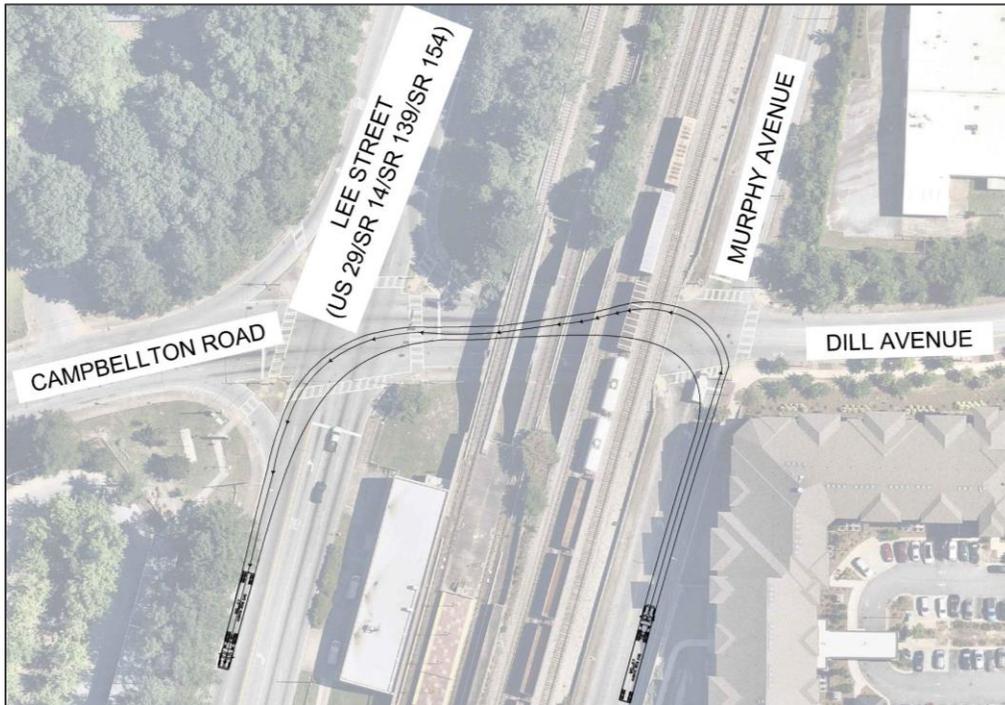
Exiting Truck from Site Southbound onto Lee Street (US 29/SR 14/SR 139/SR 154)
